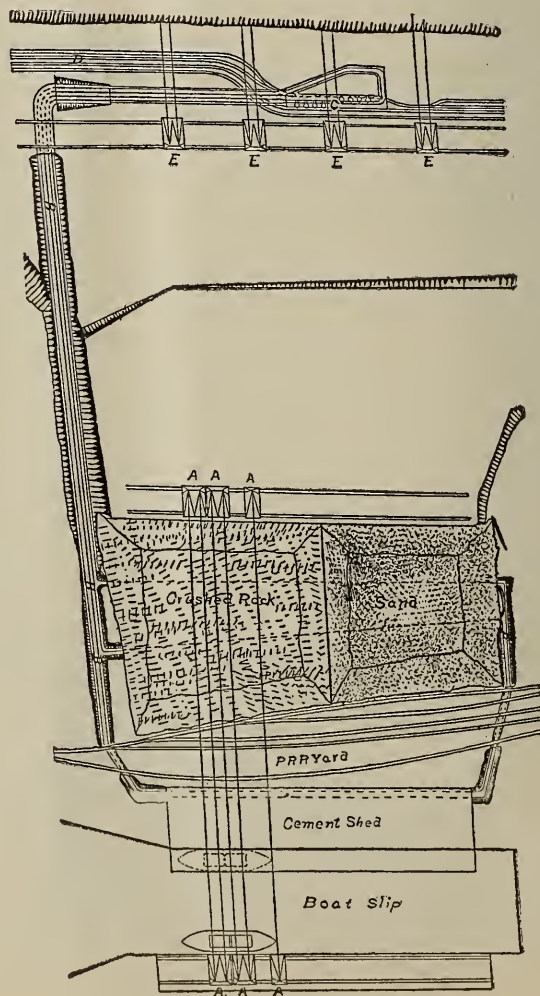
Plan of Cableways, Storage Yard, Etc.
